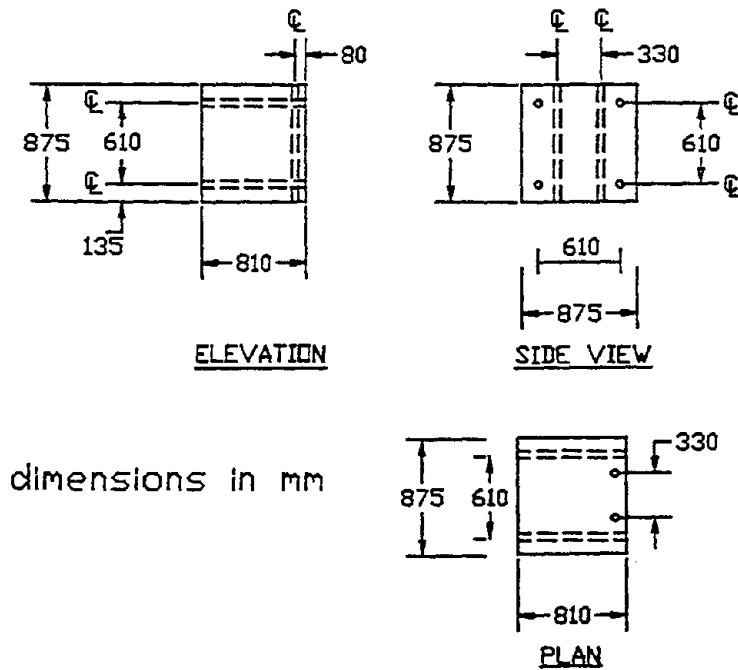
Dimensional Details of End-Block Attached to Left Side of Specimen
